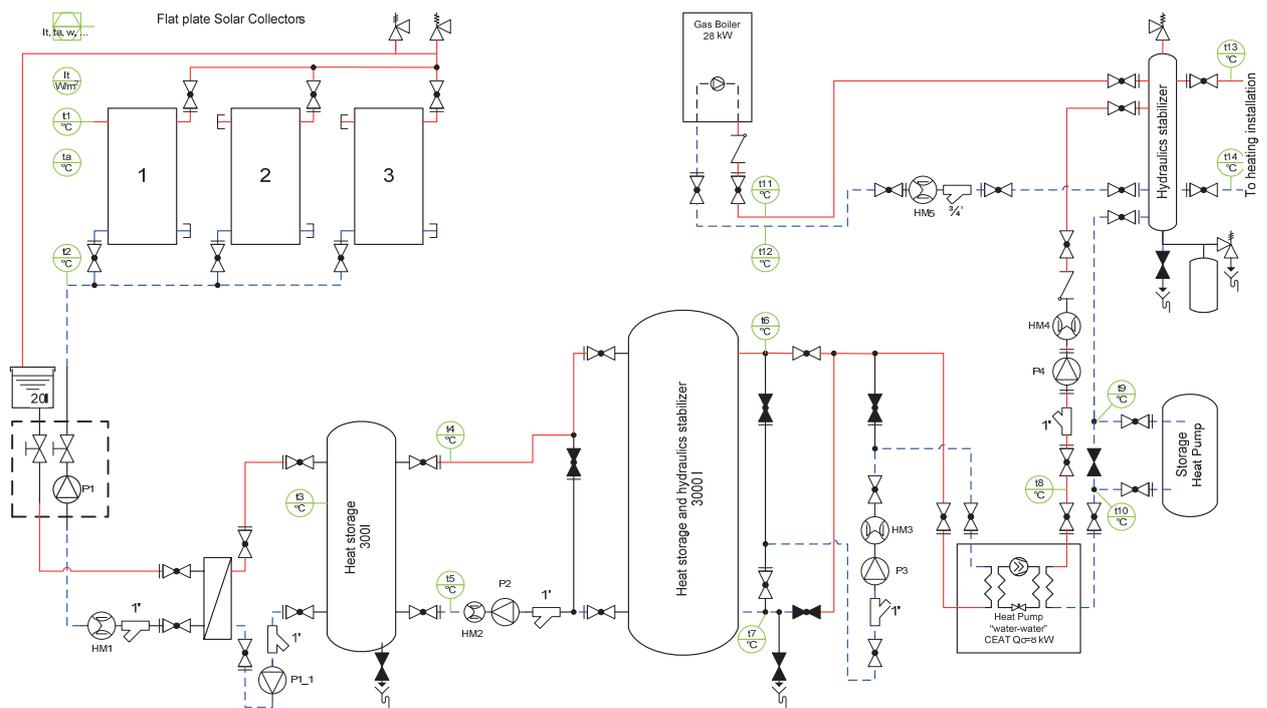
Laboratory solar thermal installation with an additional heat source – heat pump “water to water”
